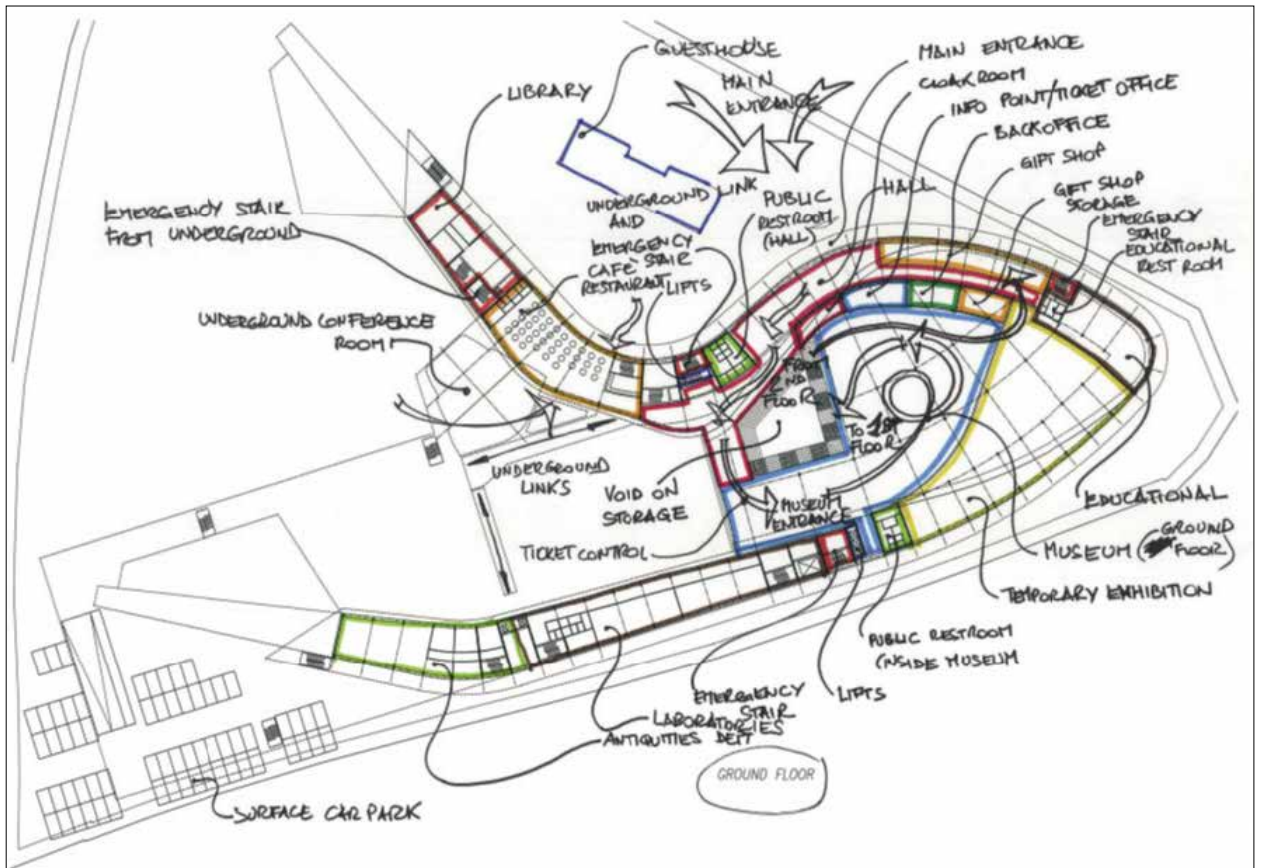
Ground Floor sketch design during the first stage of the architectural competition.
